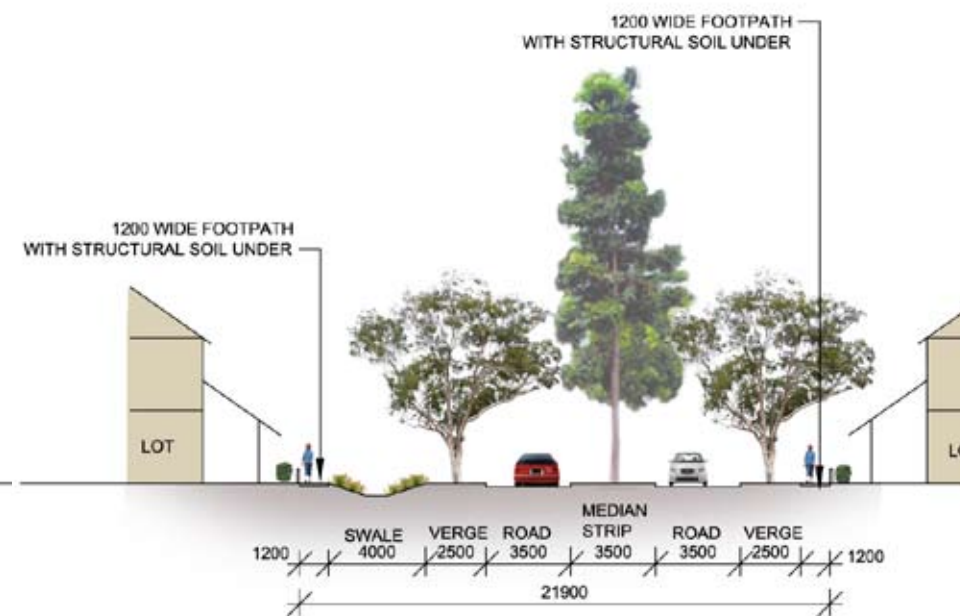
Identity planting at Brunner Road and new primary local street
